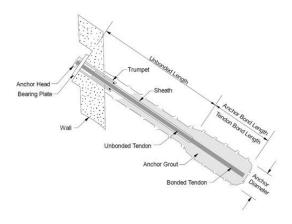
The construction of the anchor in the soil which consist of the bonded and un-bonded parts as it shown.
